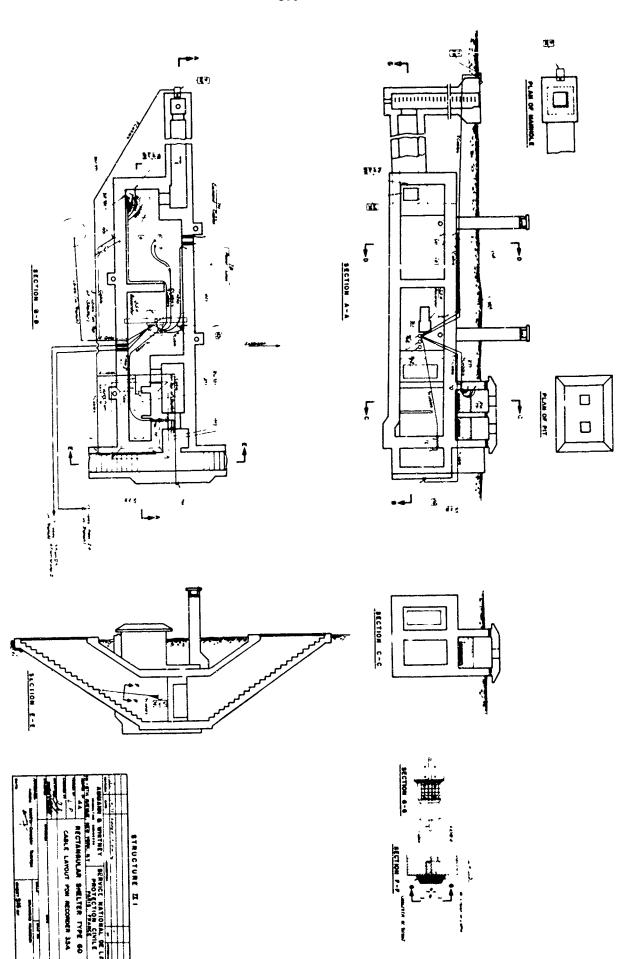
Rectangular shelter, type 60, cable layout for recorder 3.5.4.
